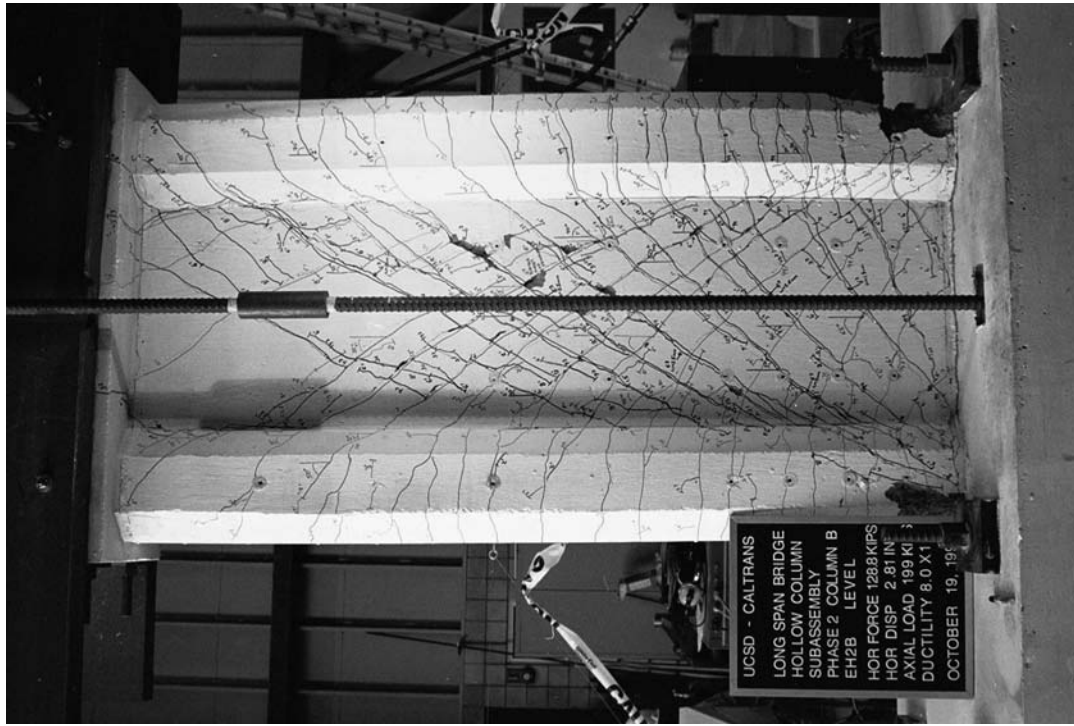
Flexure-shear cracks in Test Unit 2B.
